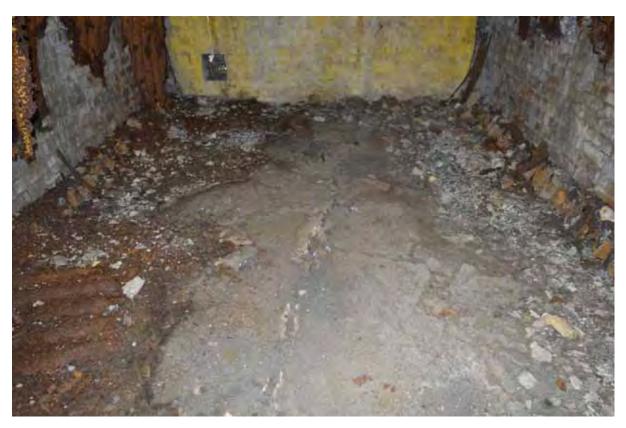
Detail of the air-raid shelter floor, facing south-west (602)
